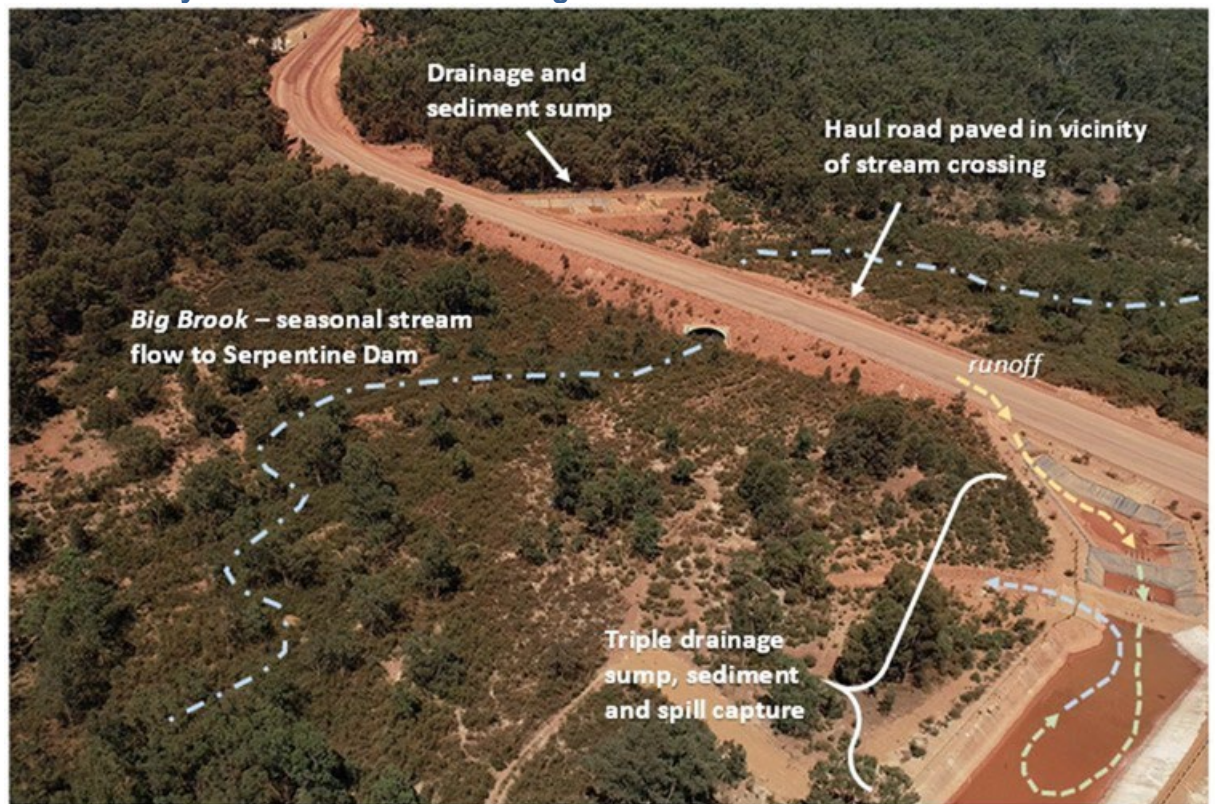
Sediment sumps at haul road crossing of Big Brook
